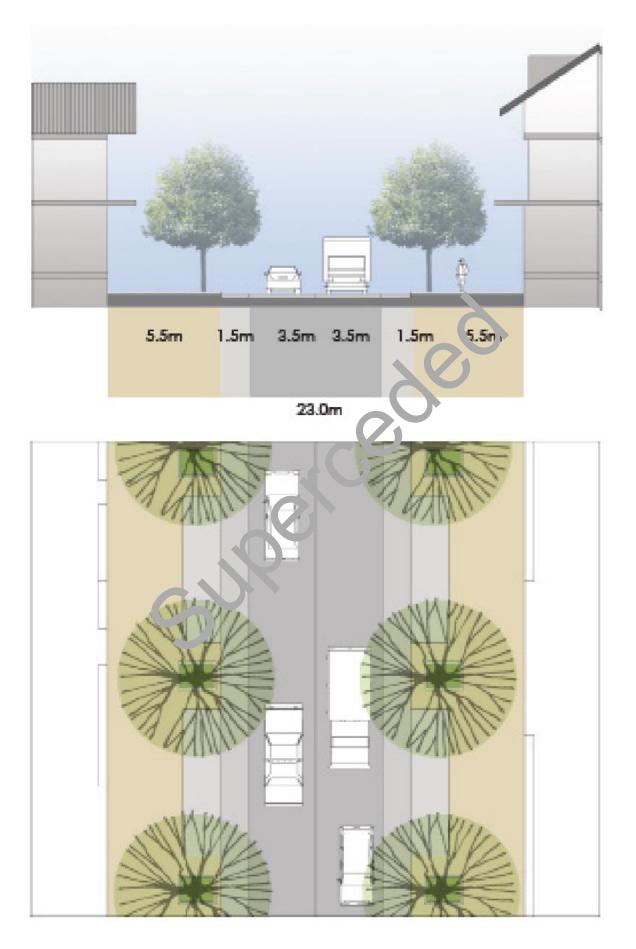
Link Road (Neighbourhood Main Street) cross section and indicative plan
